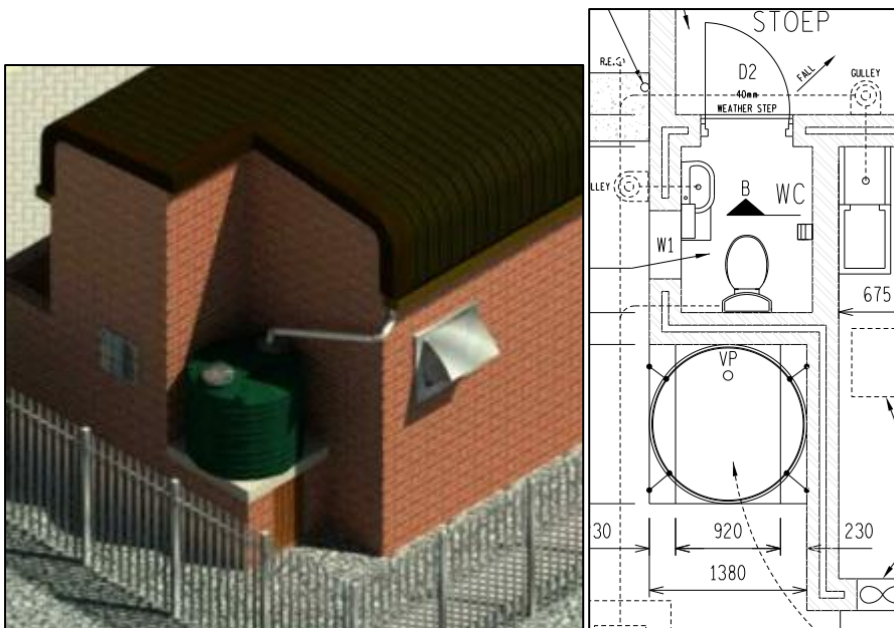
Perspective and plan views of rainwater storage tank and adjacency to Ablution and Battery Room
